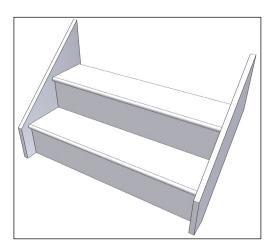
Before you start, ensure that all tread surfaces are clean, dry and free from uneven surface defects. These can be sanded away if necessary.
